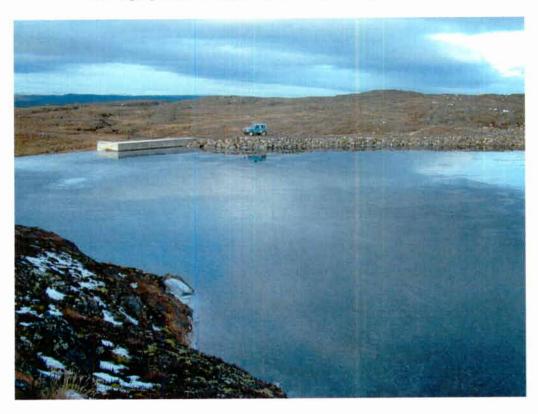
Top of Gravity Dam, looking northwest.
